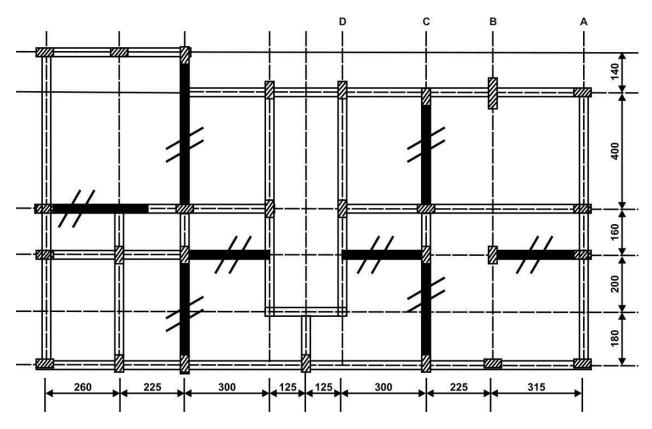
Strengthening schemes applied to the building (darker shading shows newly added RC walls)
